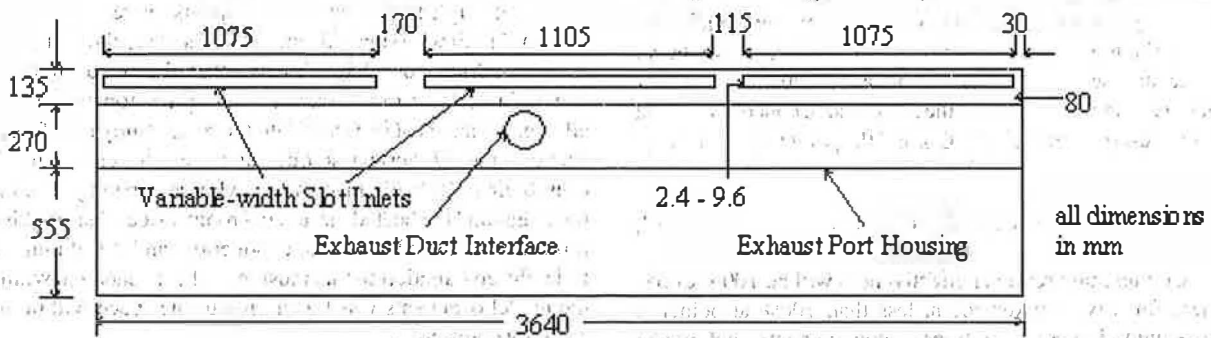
Conventional slot-inlet ventilation system supply-air inlet (side elevation view).
